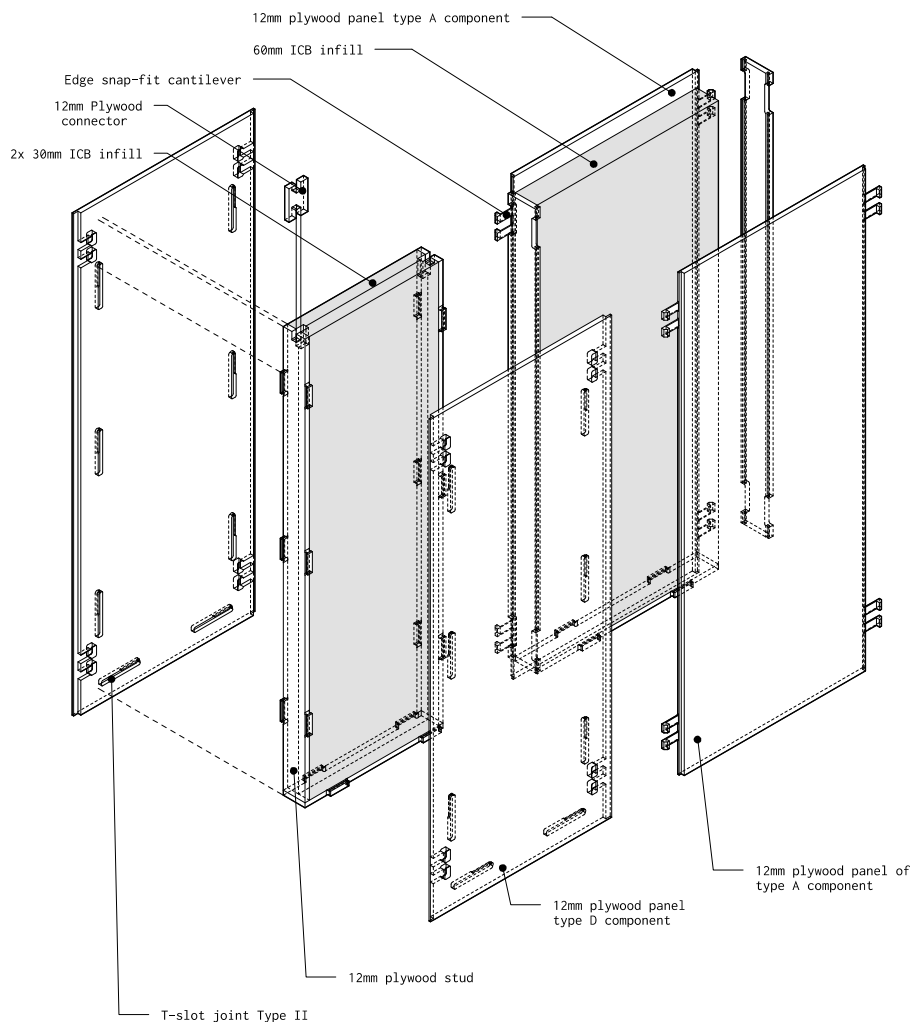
Exploded axonometric view of two ORW v3.0 components of type D and A
